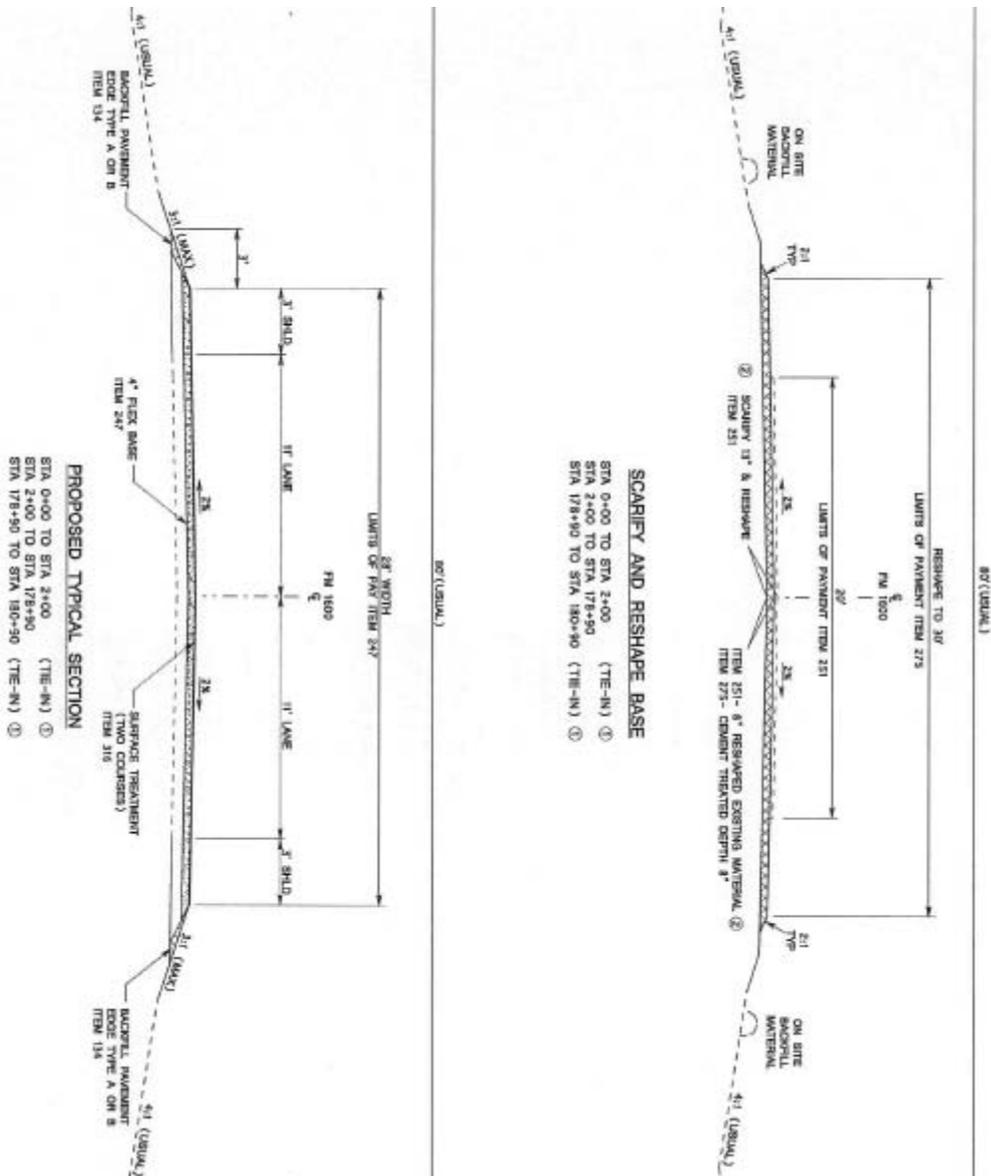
Existing and Proposed Sections for FM 1600 (Cont.).
